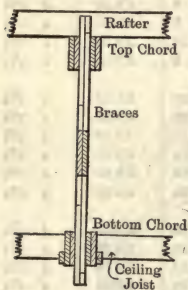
Vertical Section of Truss Shown in Fig. 19
